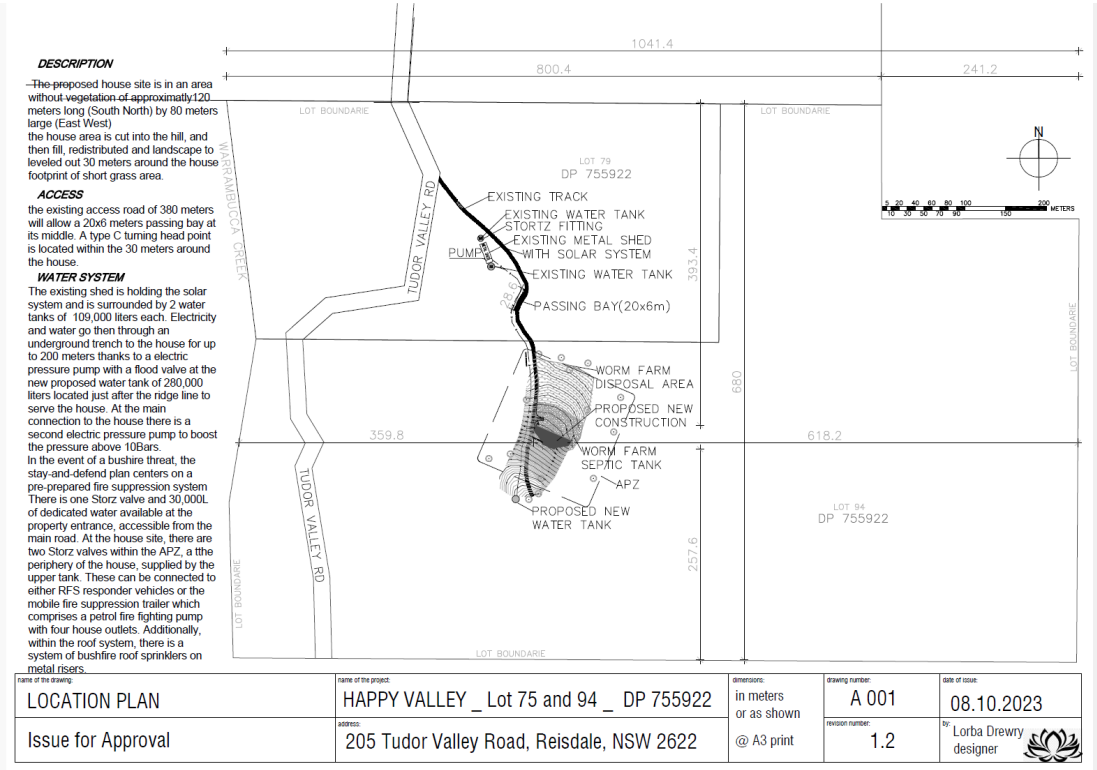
Location plan (Lorba Drewry designer, 2023)
